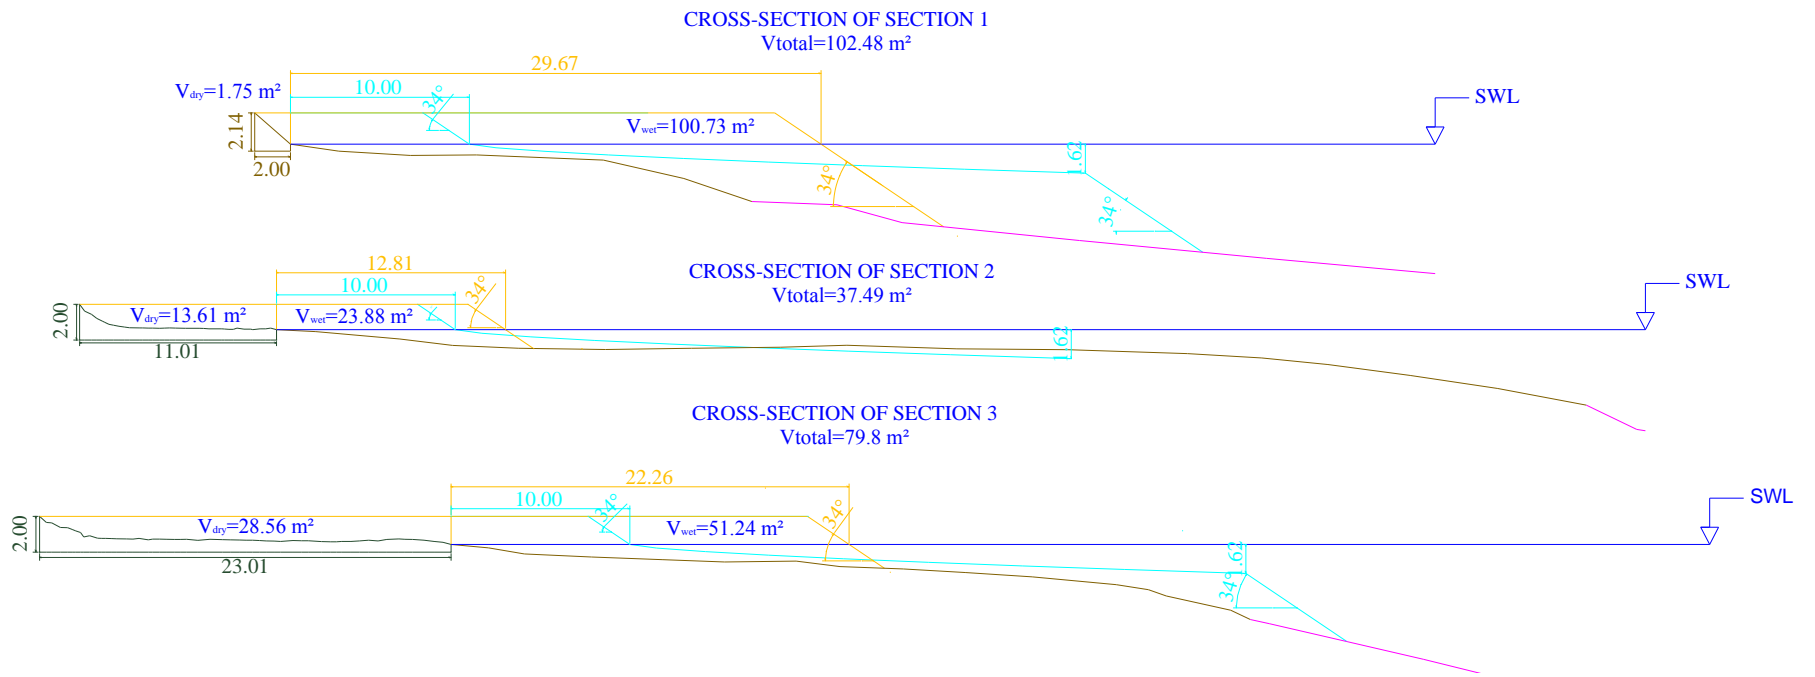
Design profiles of Section 1,2 and 3 for 10 m new dry beach width ($D_{\text{fill}}=0.45 \text{ mm}$).
